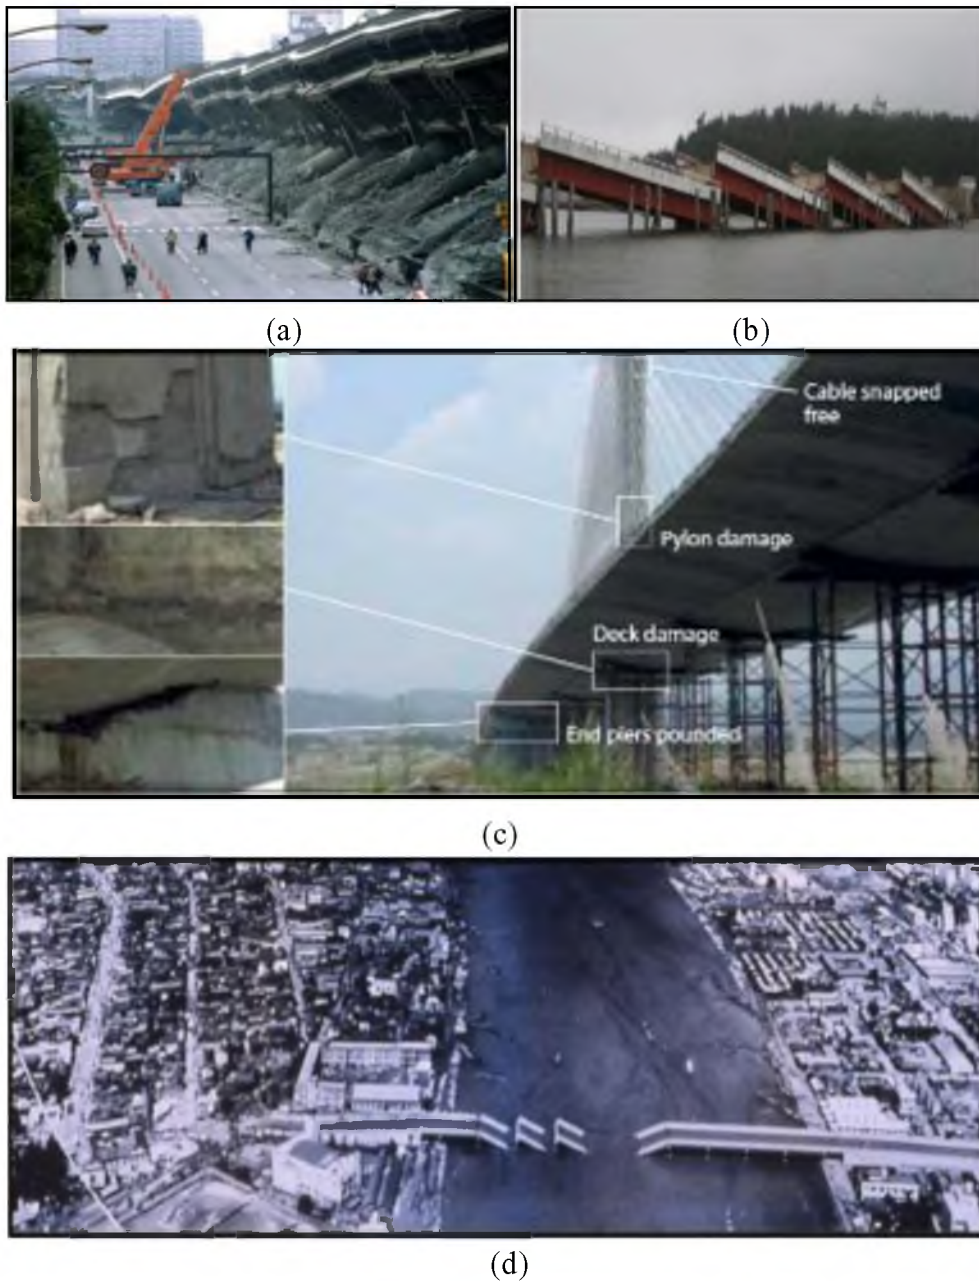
(a – d) Bridge failures due to earthquake loads
